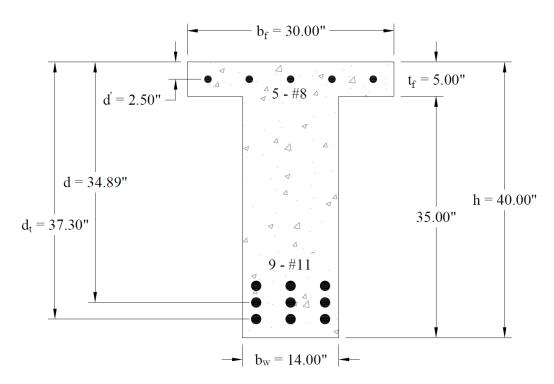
Flanged Reinforced Concrete Beam Cross-Section
